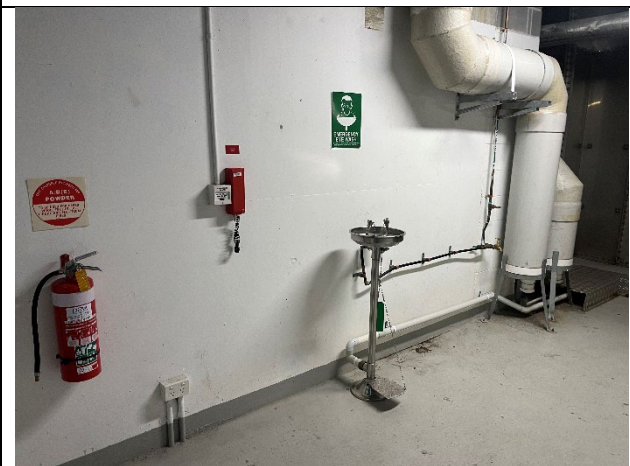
Level 4 Plant Room, eye wash and fire extinguisher.
